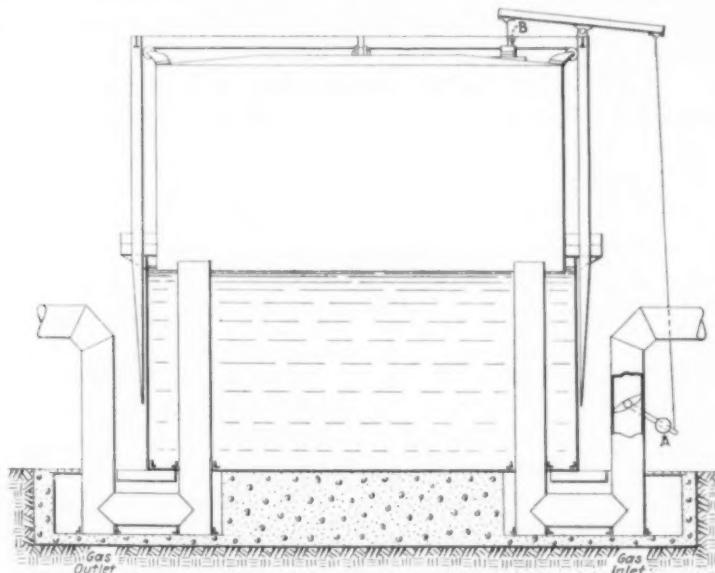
ARRANGEMENT OF REGULATING VALVE FOR GAS HOLDER
